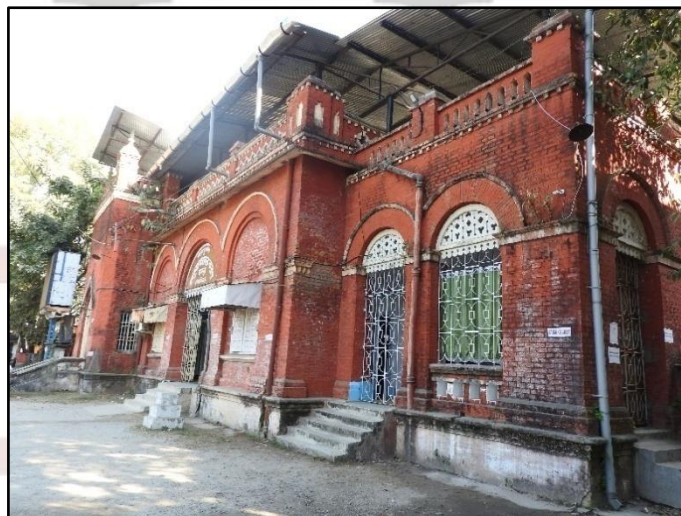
Existing old surface drainage system of the heritage building has disappeared and indiscriminate laying of rain water pipes etc have caused dampness into the old masonry walls
